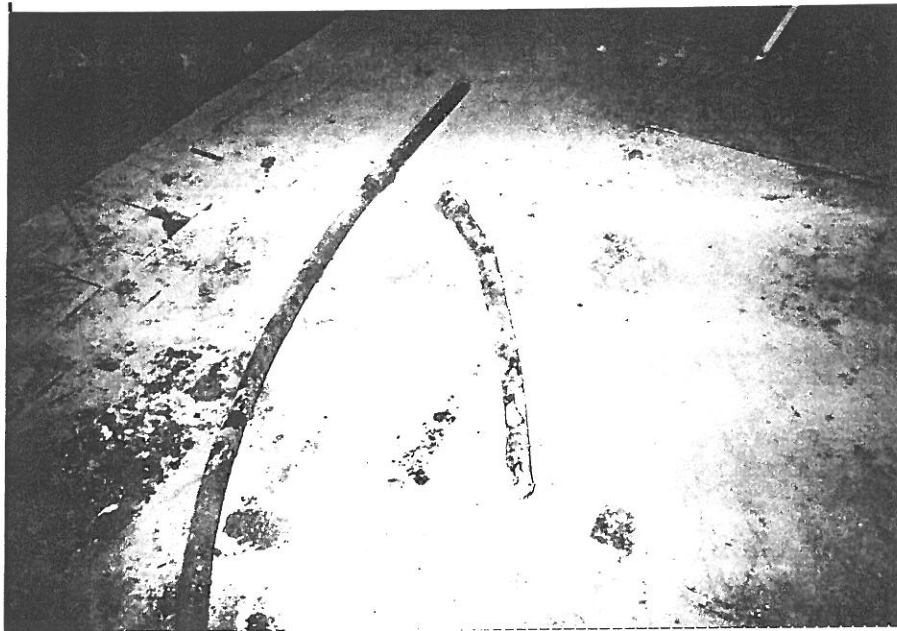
SECTIONS OF PIPE FOUND IN TRENCH (NOTE
